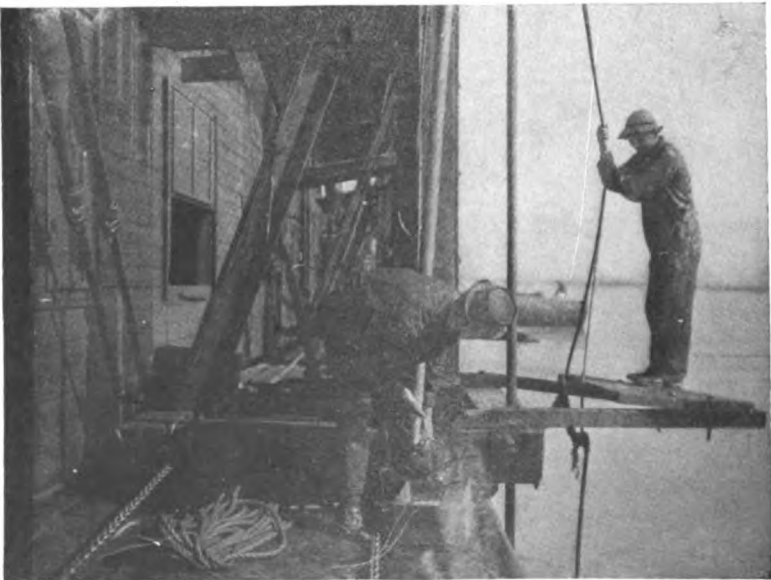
Changing Steels on Drill Boat "Destroyer."
